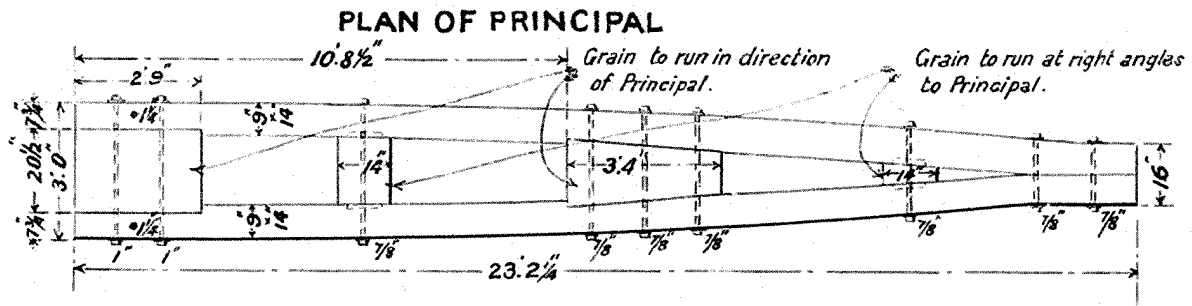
Plan of Principal with Notching and Spacer Orientation in McDonald Truss at Tarraganda
